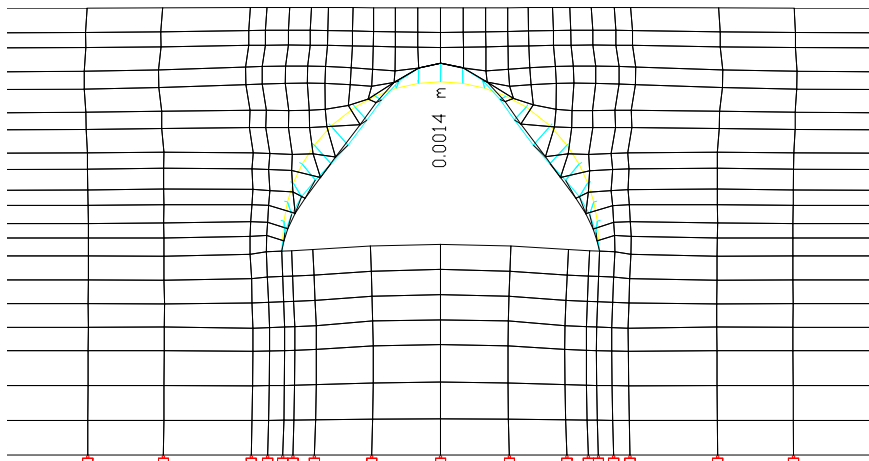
Displacement after complete backfilling calculated in FEM for construction placed on rigid concrete foundations
